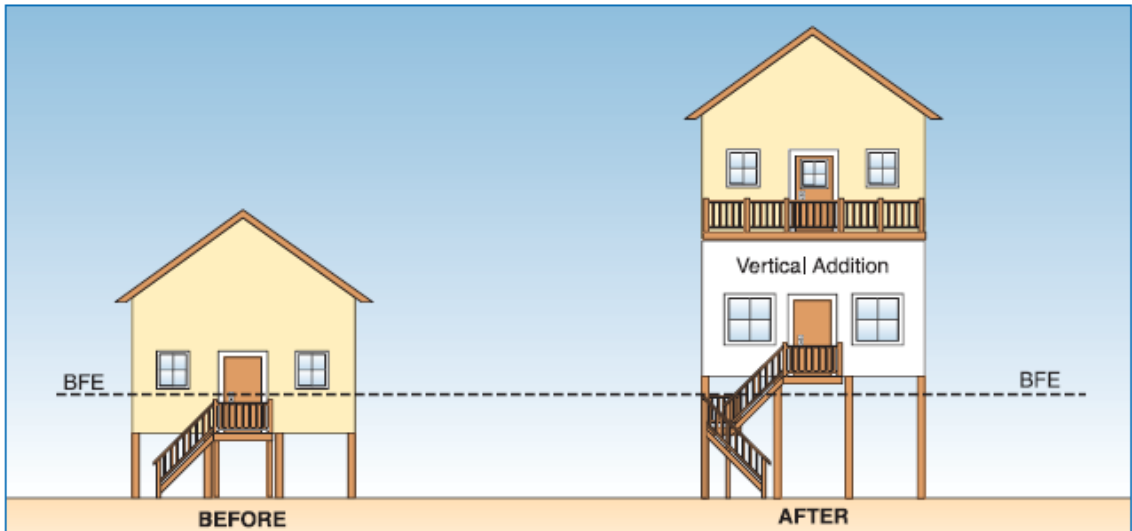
Vertical addition to a pre-FIRM residential building (in any zone) – the proposed work is a new lower story that involves structural modification. The work constitutes a substantial improvement. The building and the new lower story are elevated on a compliant foundation.
